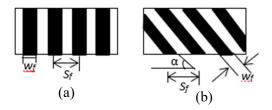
FRP wraps as (a) straight or (b) inclined strips
